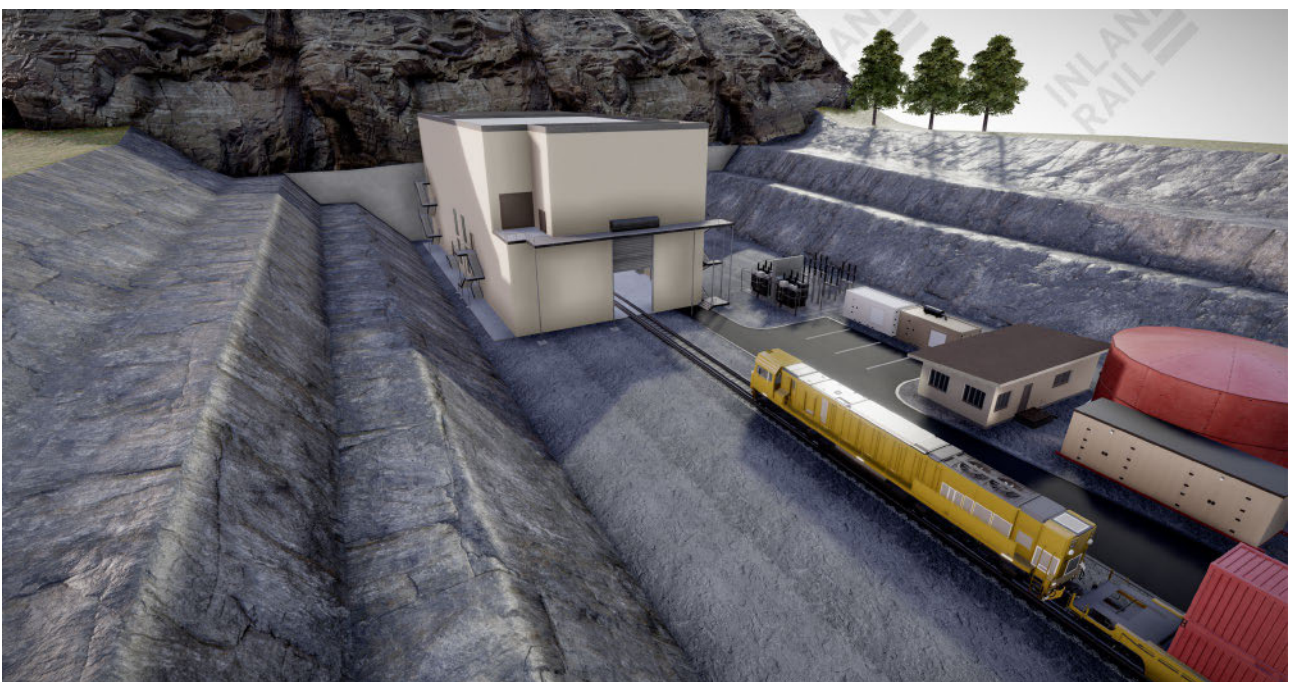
SCHEMATIC OF THE PROPOSED WESTERN TUNNEL PORTAL, WITH A TRAIN ENTERING THE VENTILATION BUILDING
